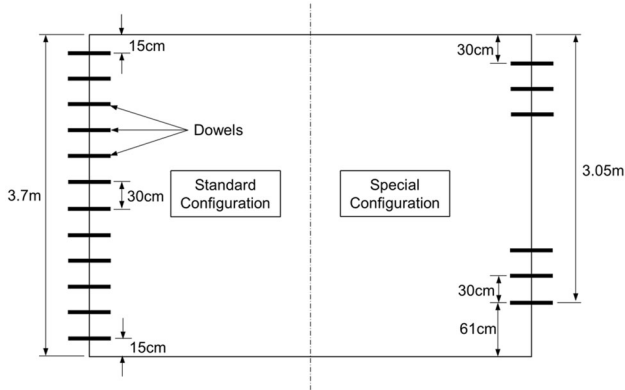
Schematic layouts for project sections with different dowel arrangement.
